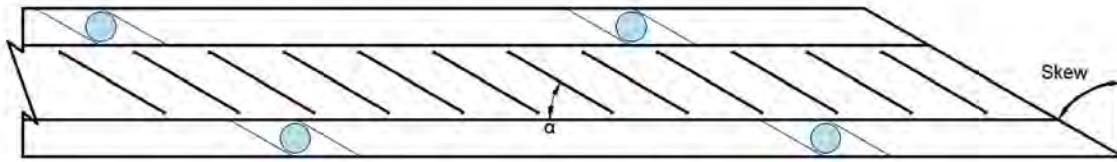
Plan View of 60 Degrees Skewed ITBC
